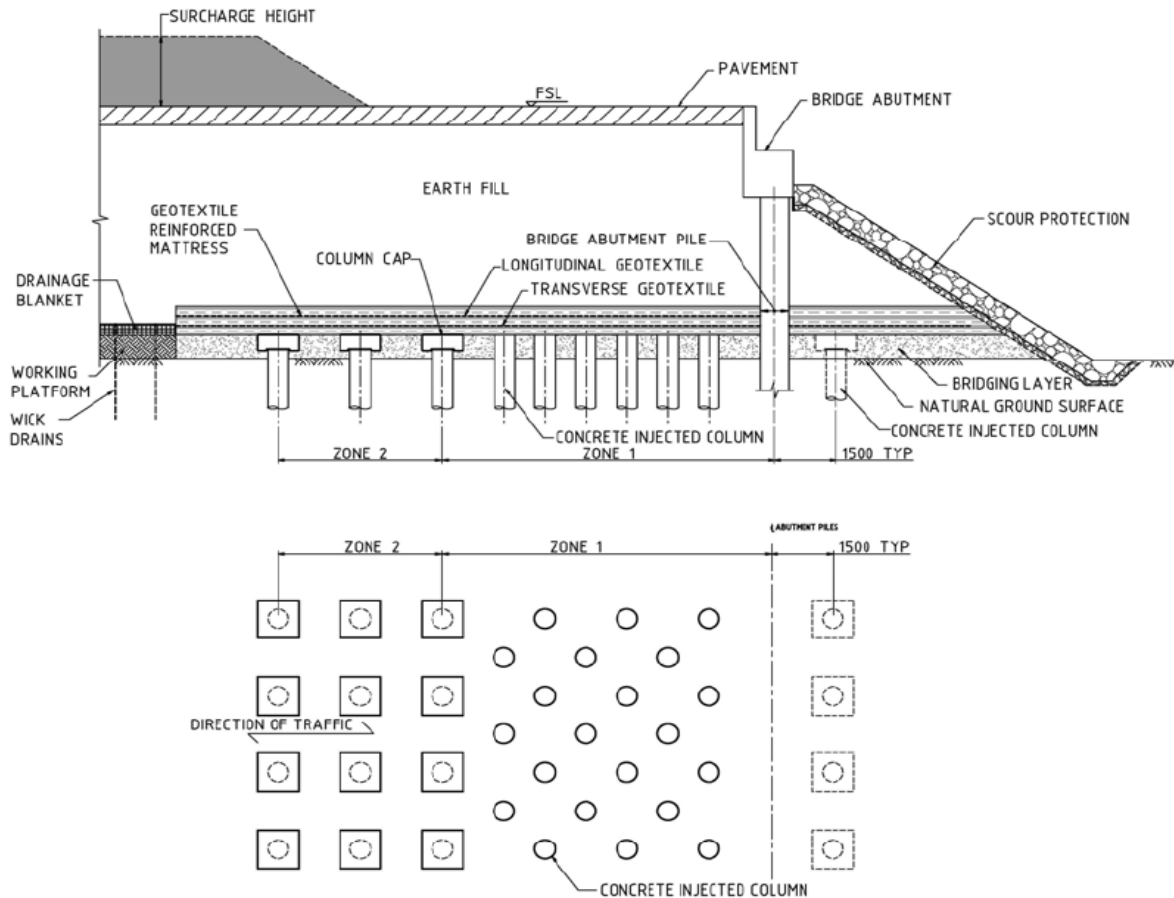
Installation of Concrete Injected Columns (Hsi, 2008)
